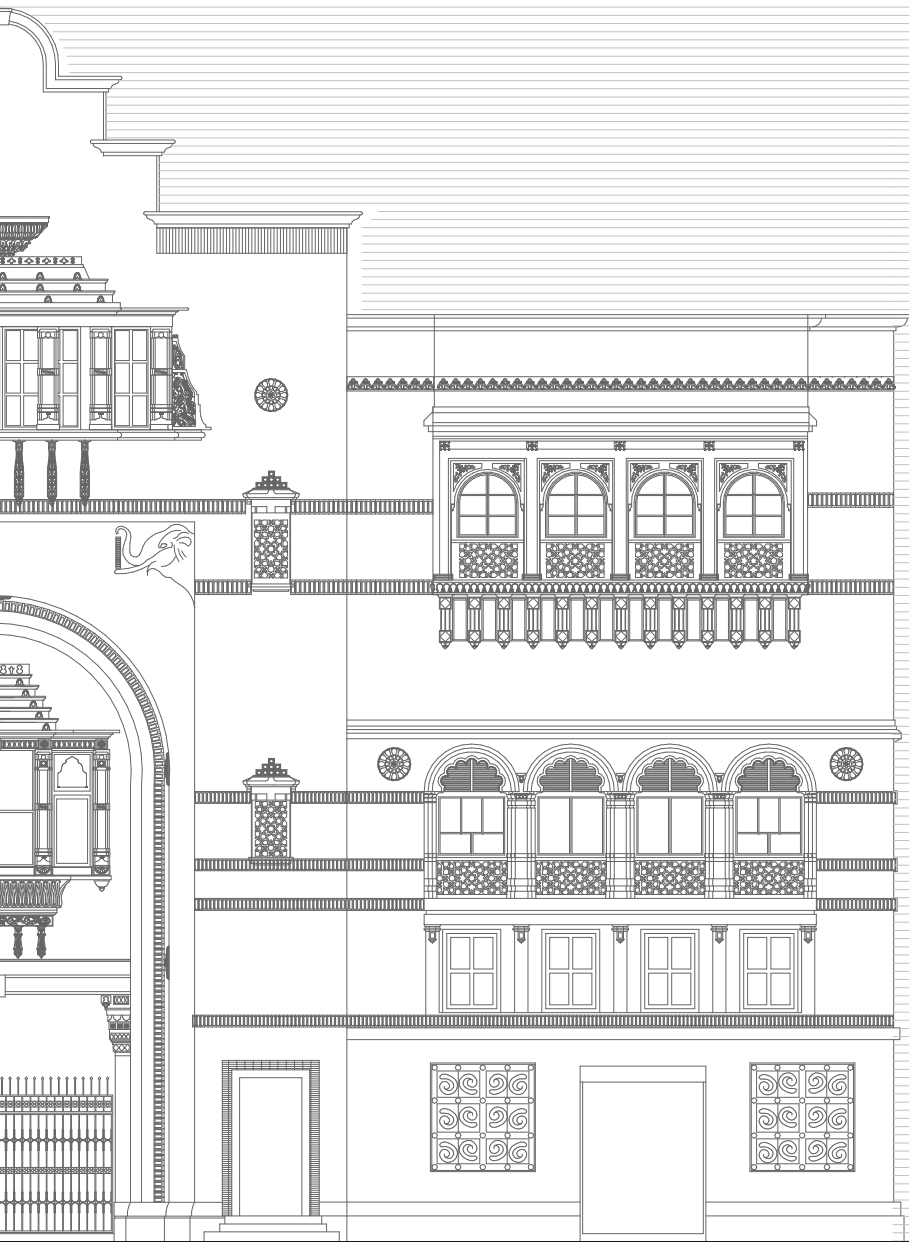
LAKSHMI BUILDING - SOUTH ELEVATION - Scale 1:500.
